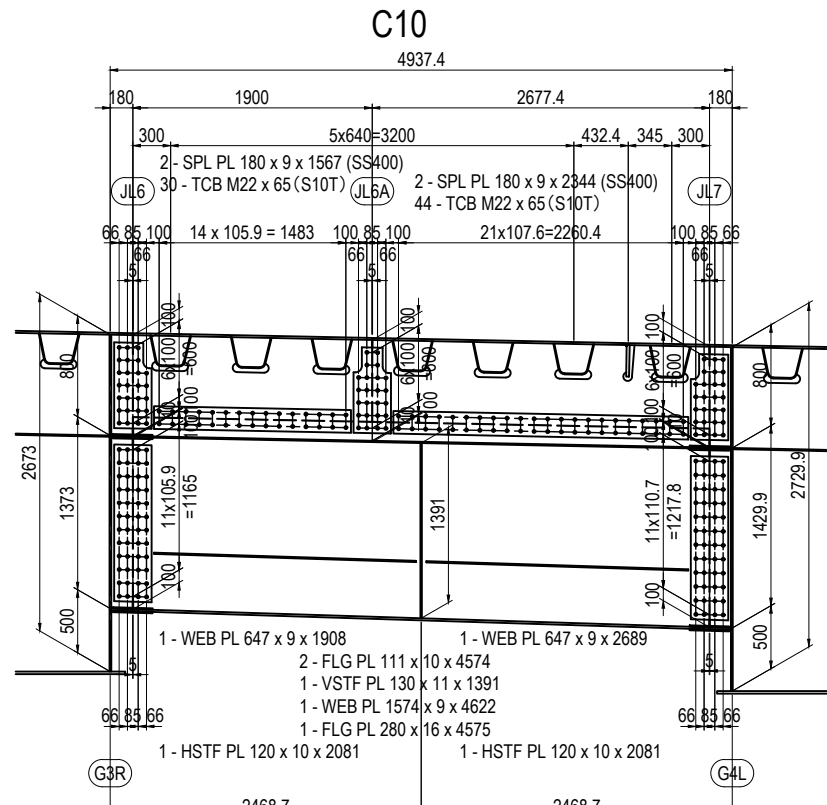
DETAIL OF CROSS GIRDER SECTION (7) S=1:60 C4 TO C12 (4)
